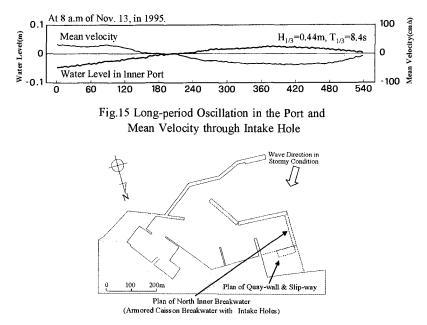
Plan View of Kudoh Fishing Port Case study on Kudoh Fishing Port
